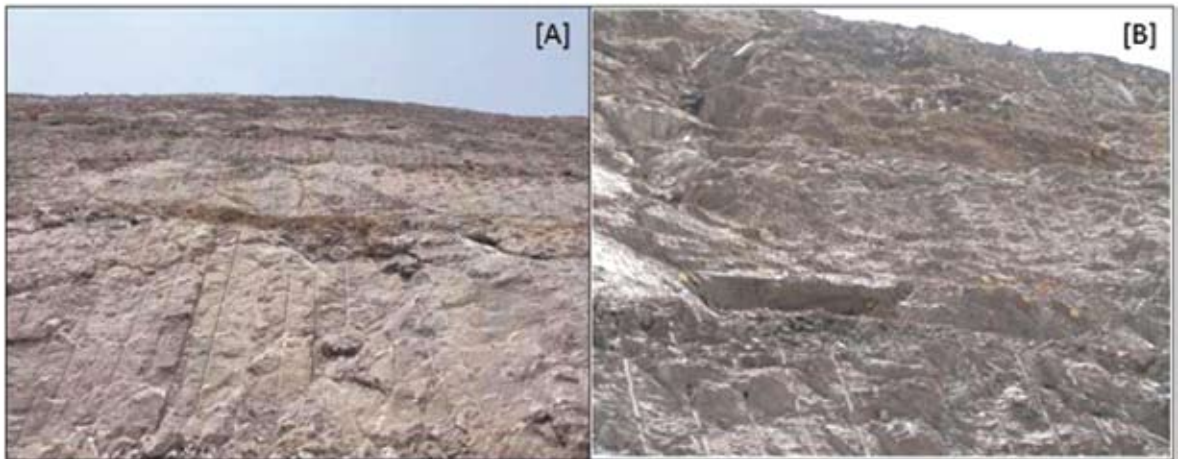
[A] The close view of benches with stable pit walls; [B] Strengthening of damaged pit wall having geological discontinuities by bolting and wire netting.
